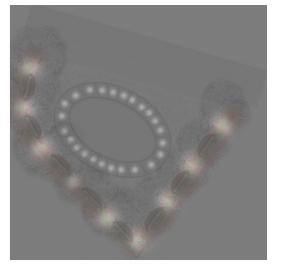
Outdoor Exhibition Space Lighting Plan / 1:600
